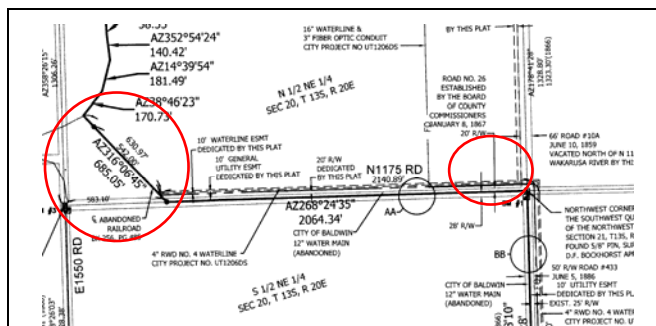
Preliminary Plat detail with 1/2 the abandoned railroad right-of-way and right-of-way for N 1175 Road terminating at E 1600 Road.
